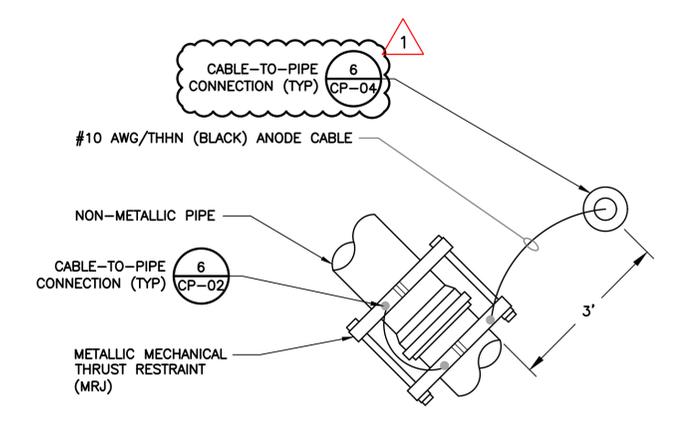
OFFSET (HDPE PIPE) - ANODE & TEST STATION
